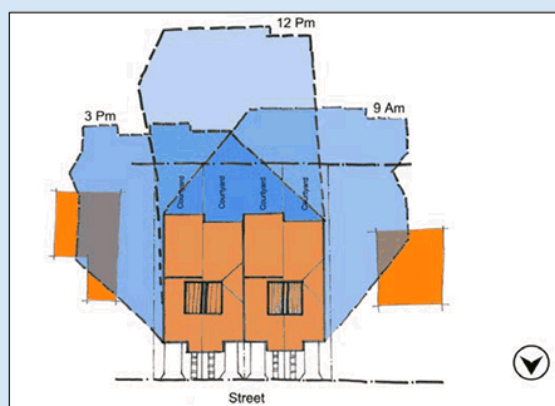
Example Solar Access to Adjoining Properties and Principal Private Open Space
